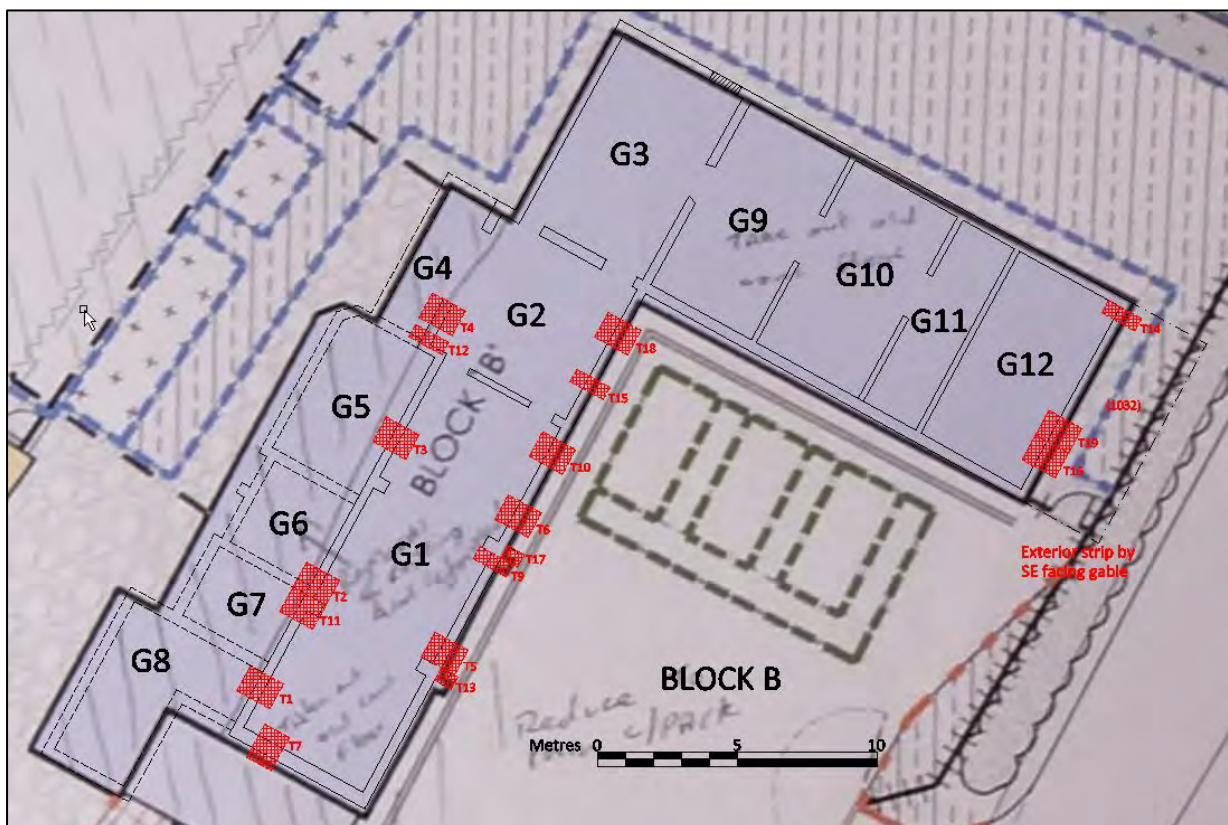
Plan showing locations of observed Block B underpinning slots. Scale: as shown.
